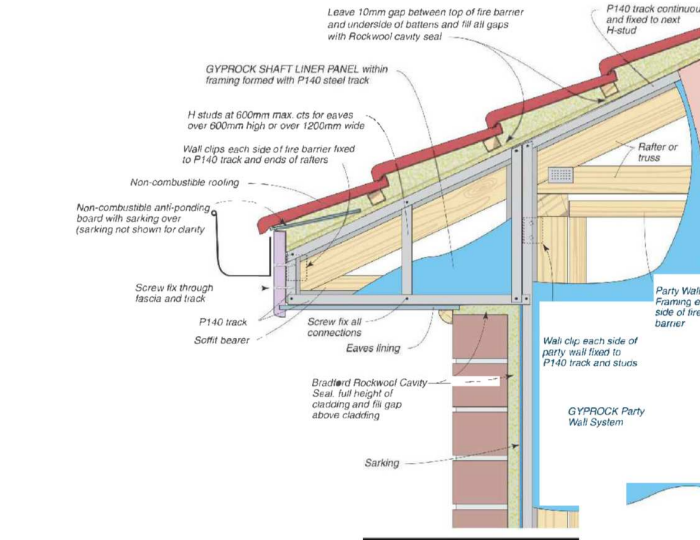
DETAIL AT EXTERNAL TIMBER FRAME WALL
